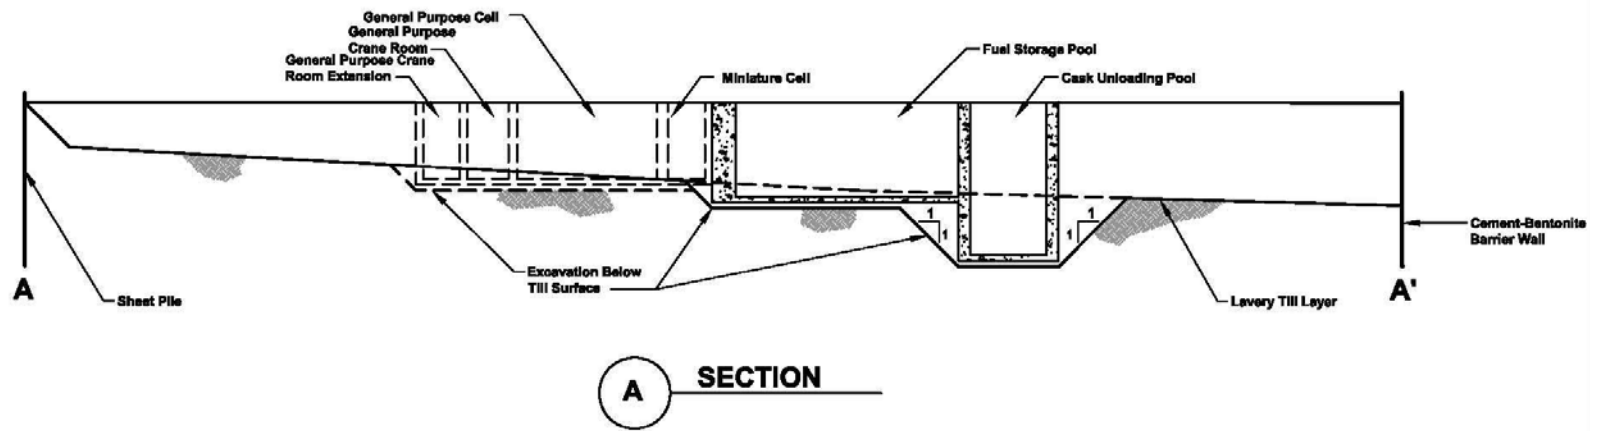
Excavation Cross Sections (From URS Drawing C-102)
